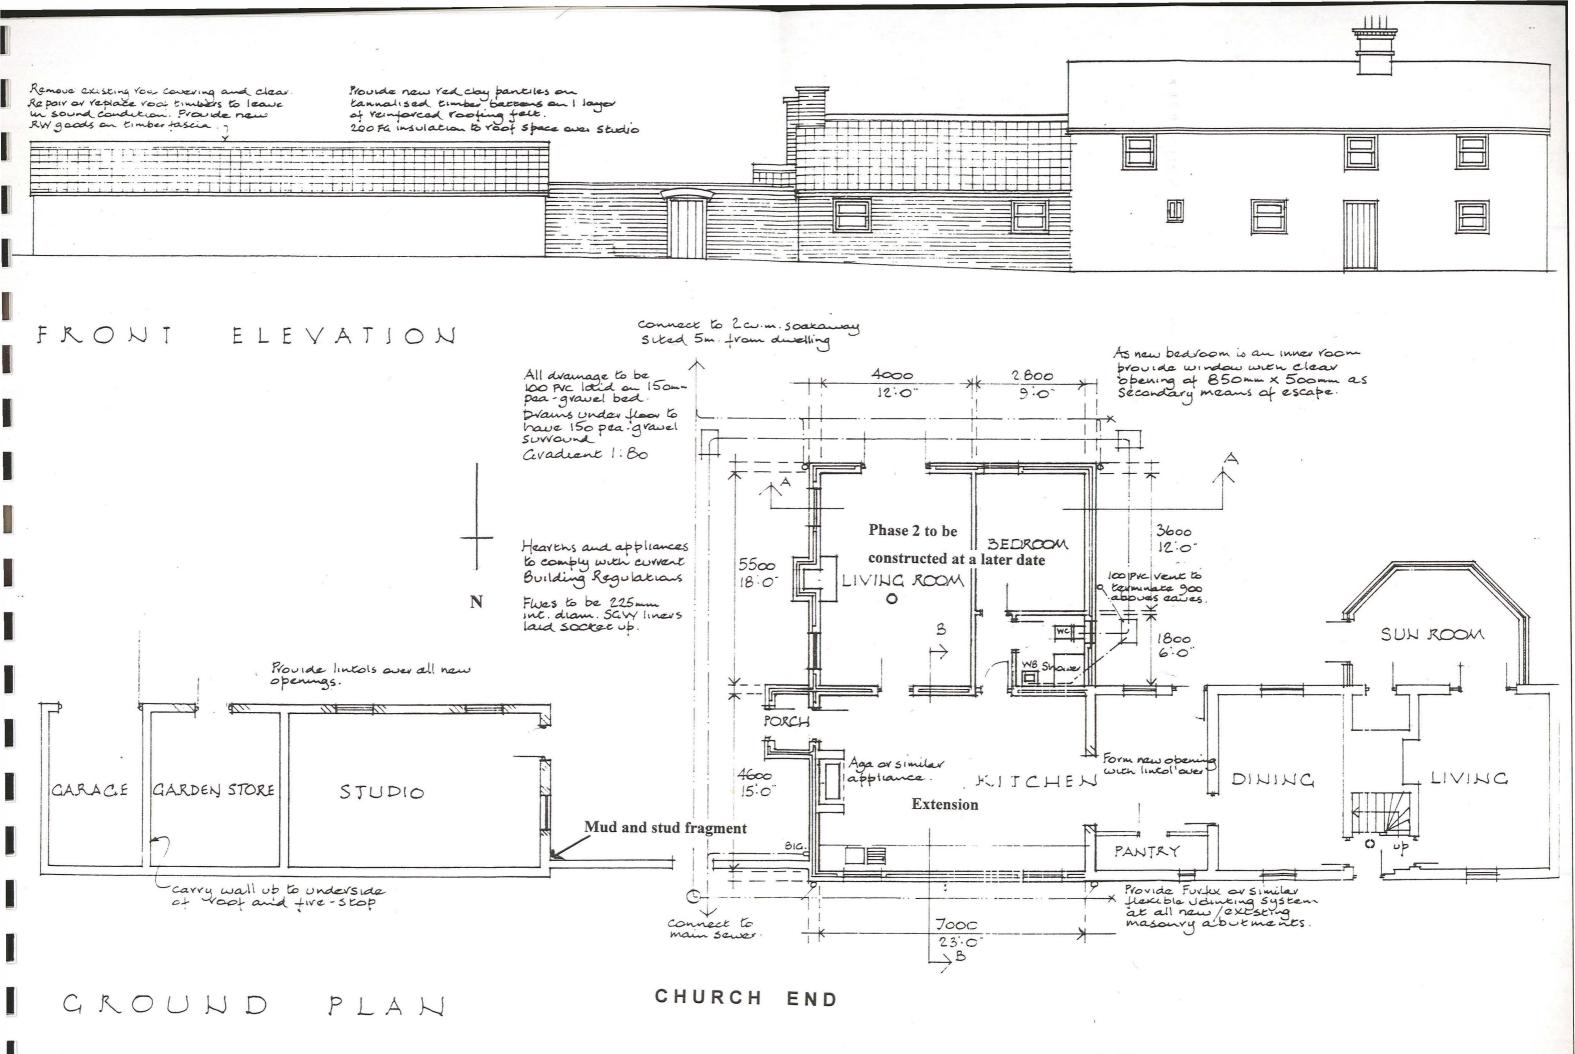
Plan and elevation of extension from architect's drawing (J.S.Grant) supplied by the client. Scale 1: 100.
